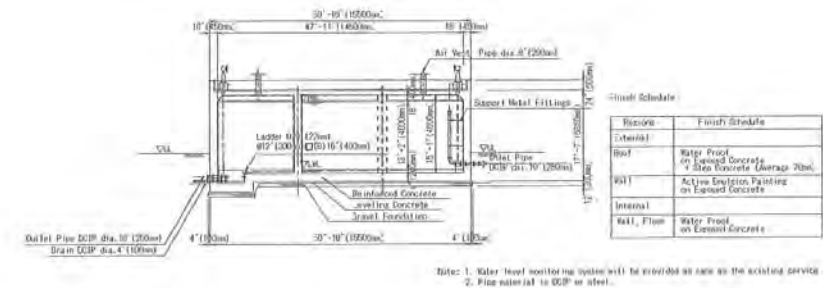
Proposed Section of Malakal Service Tank
